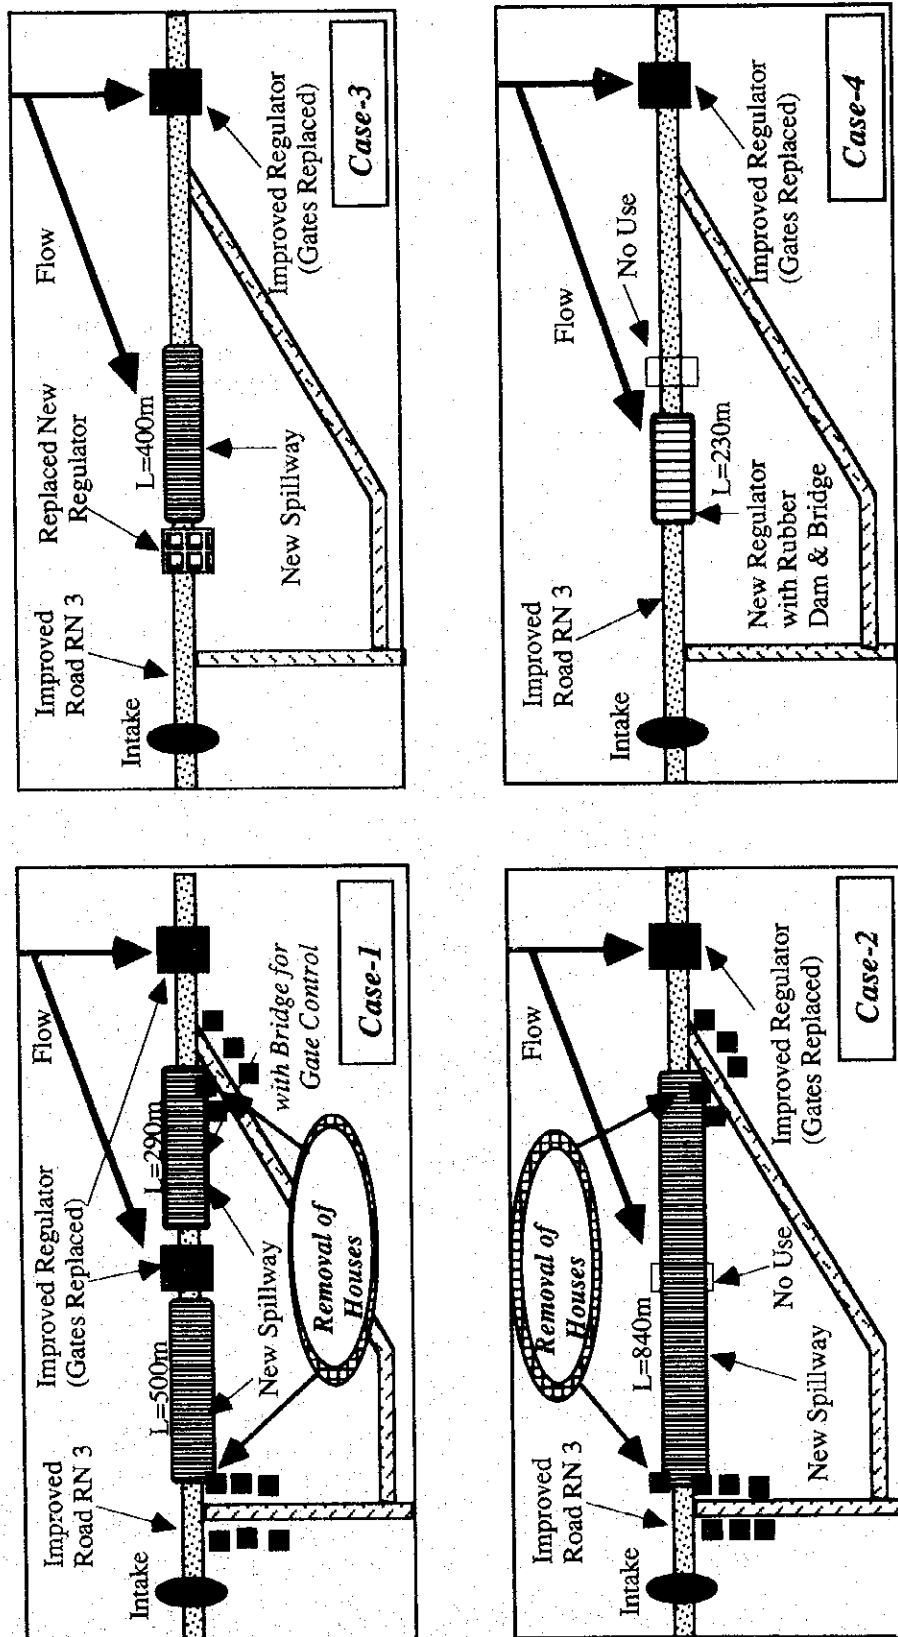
Alternative Plans of Improvement of Kompong Tuol Irrigation Intake
